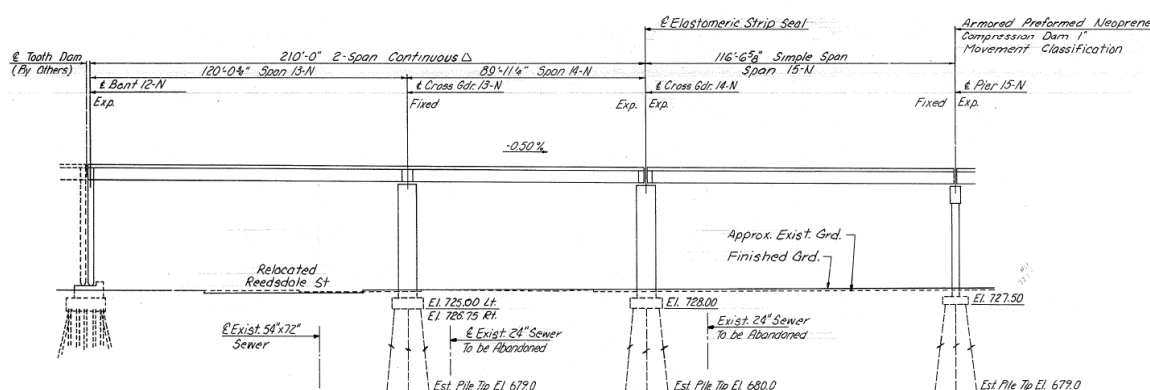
Example of Piers Supporting Multiple Spans
